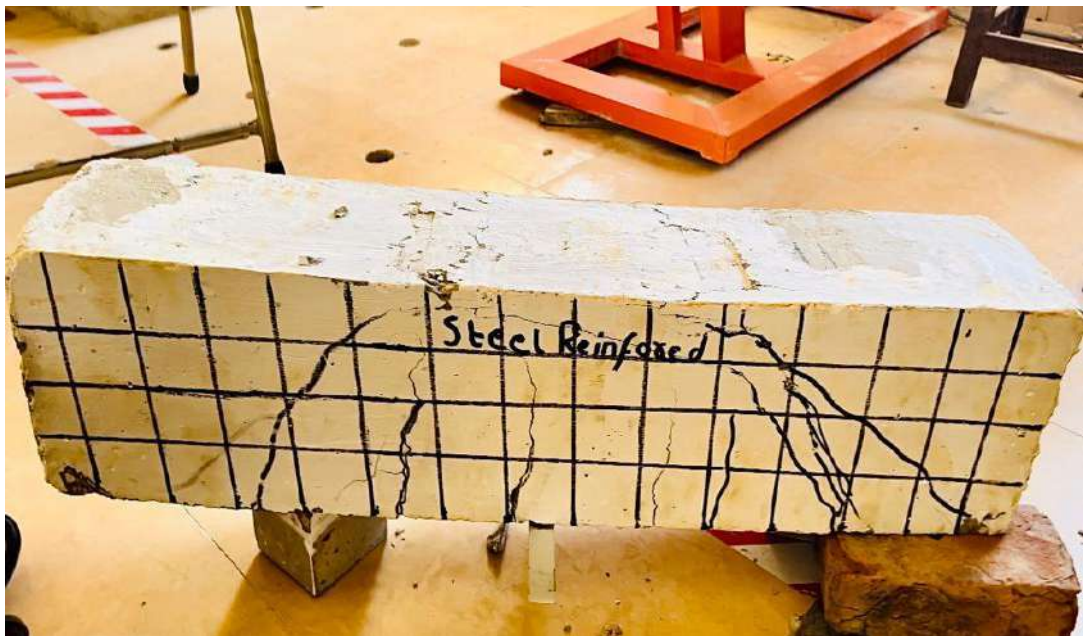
19: Cracks Pattern in Steel Beam 3
